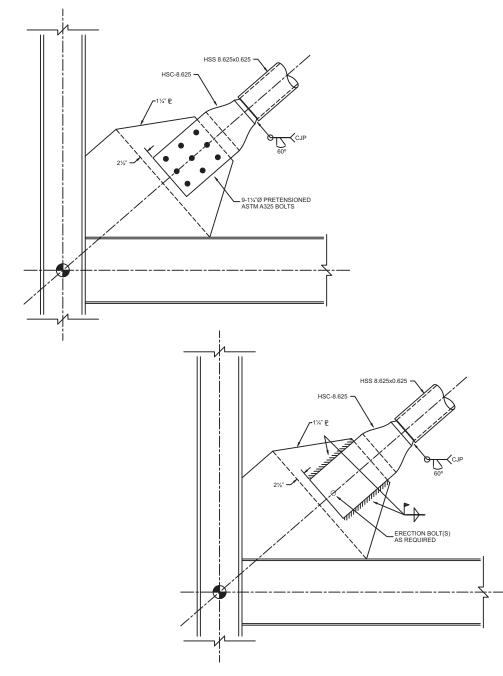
Field bolted (top) and field welded (bottom) brace connection configurations using High-Strength Connectors
